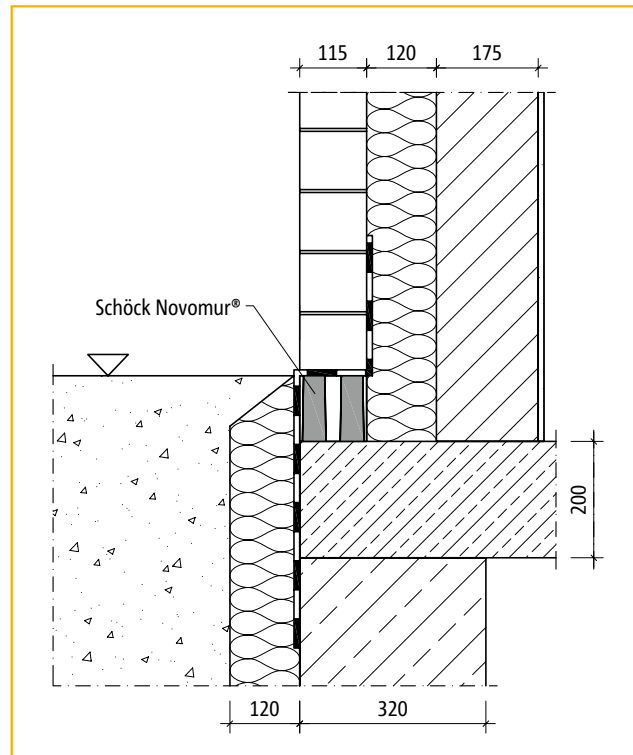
Schöck Novomur® installed in filled cavity wall system
